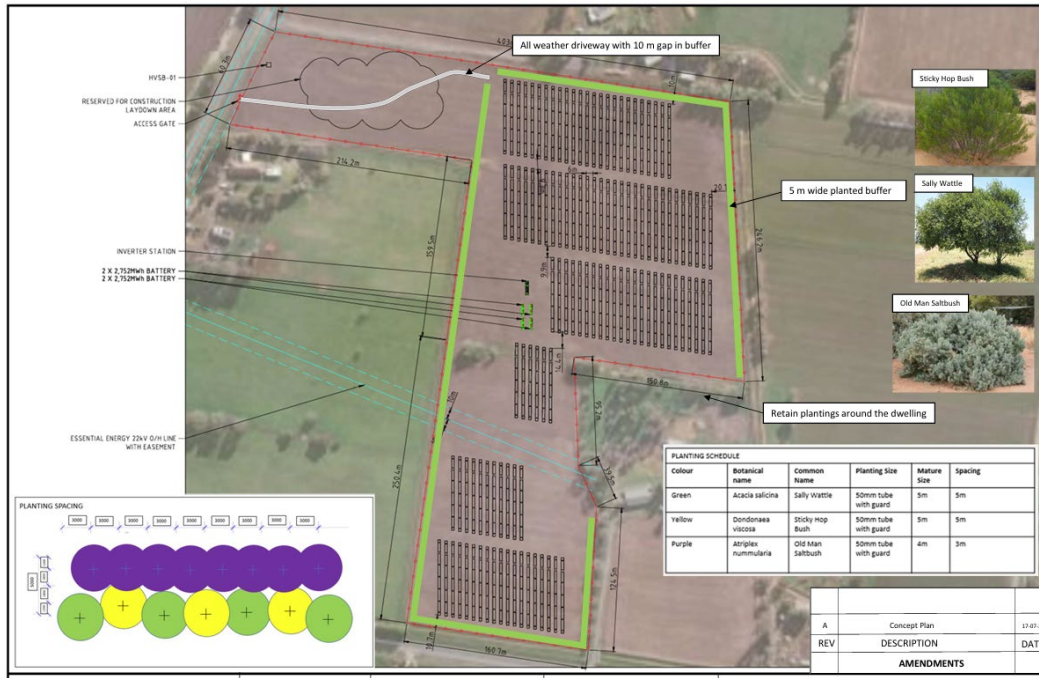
Proposed landscaping plan along the whole perimeter of the site
